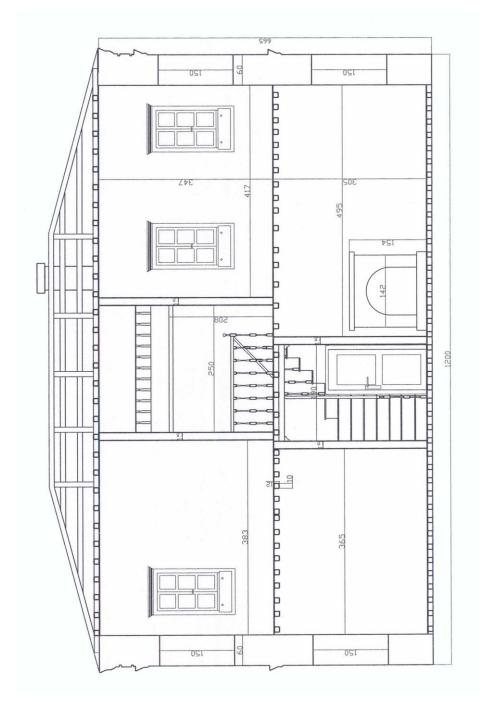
Section A-A view of 39-Türkkuyusu Street Scale: 1/75
